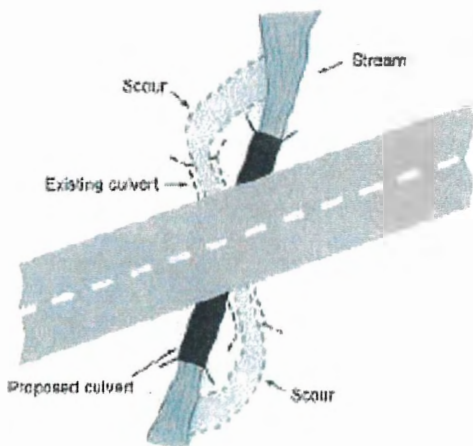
Culvert alignment should be in relation to the stream and not the road. It is important that the stream enters and leaves the culvert in a relatively straight horizontal alignment so streamflow does not have to turn to enter the inlet or discharge into a bank as it exits. This figure shows a redesigned culvert installation that replaces the bending alignment that previously existed. Channel turns at the inlet increase plugging potential because wood going through the turn will not align with the inlet. Similarly, channel turns at the inlet and outlet are often accompanied by scour against the channel banks (Wisconsin Transportation Information Center, 2004).
